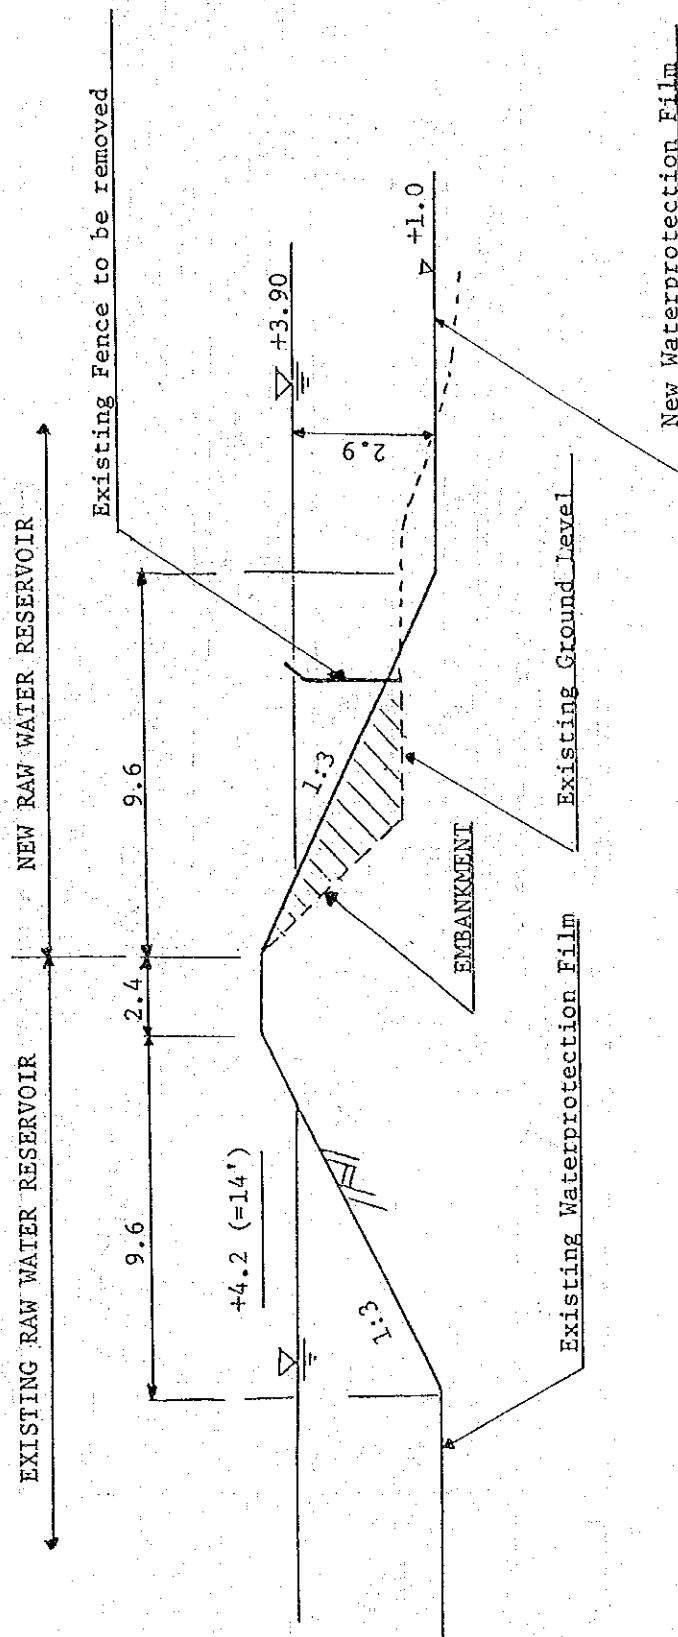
(1/5) PLAN OF NEW RAW WATER RESERVOIR
